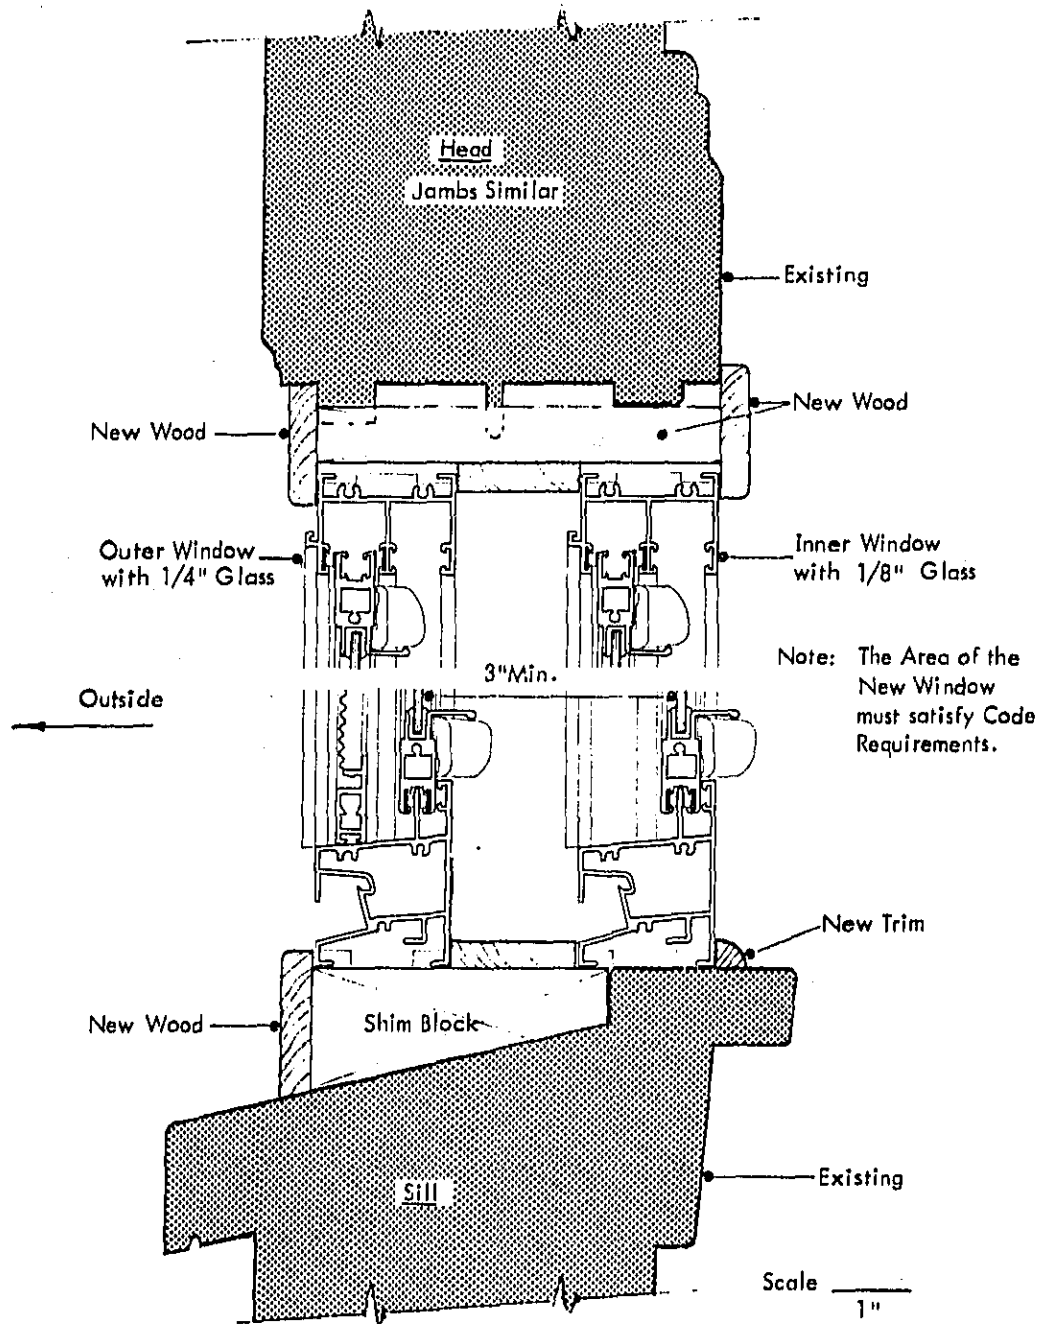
A METHOD OF INSTALLING DOUBLE WINDOWS WITHOUT REMOVING THE EXISTING WINDOW FRAME. (SEE THE NOTE.)
